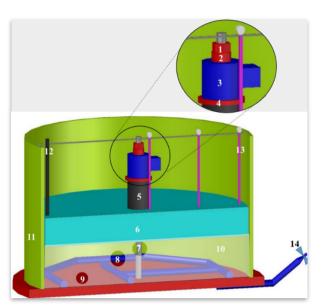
A 3D schematic of the proposed slab test set-up and its details.
